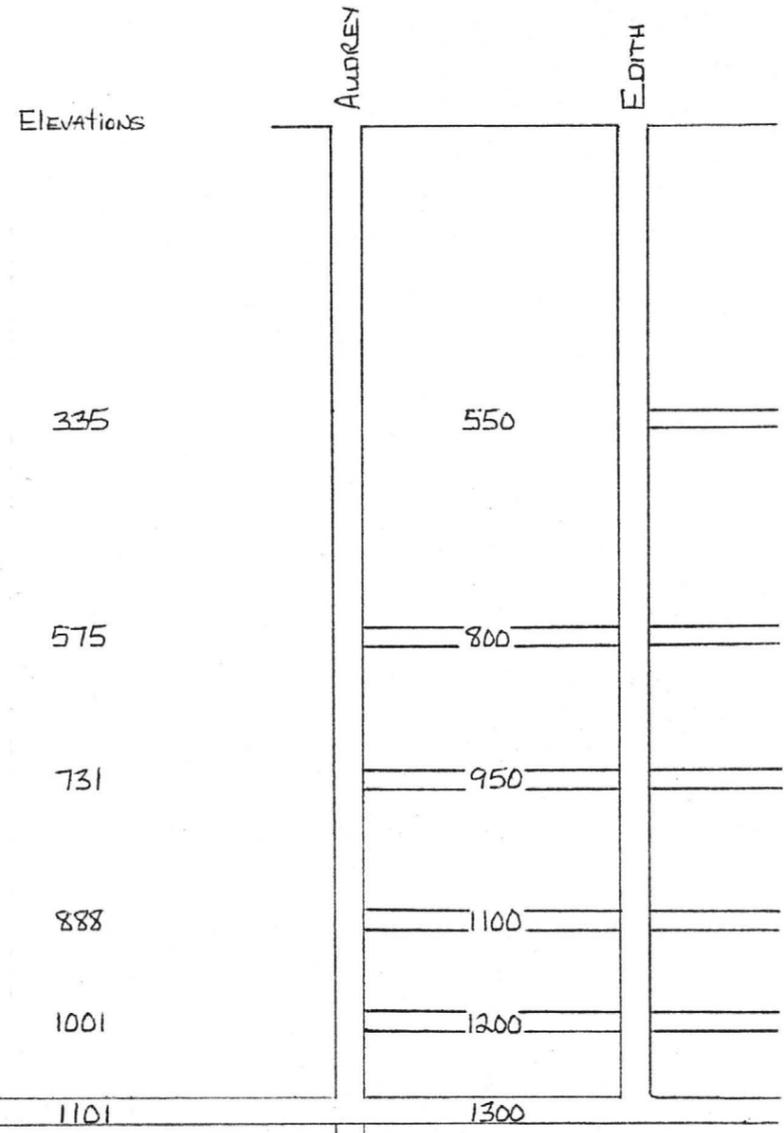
EXHIBIT A -- SECTION OF THE JOSEPHINE TUNNEL, AUDREY, AND EDITH SHAFTS, UVX MINE.
